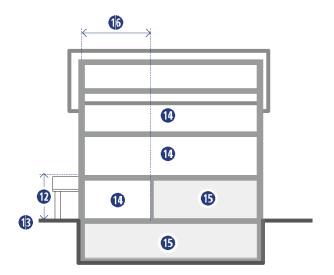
Detached House Building: Floor-to-Floor Height & Use Requirements
